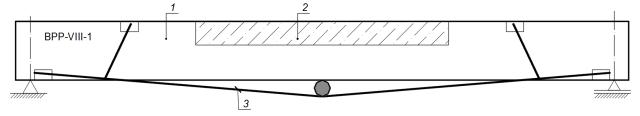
Schemes for reinforcement of BPP-VIII-1beams: 1– investigated beam; 2 – pressed reinforced concrete insert; 3 – external reinforcement system
